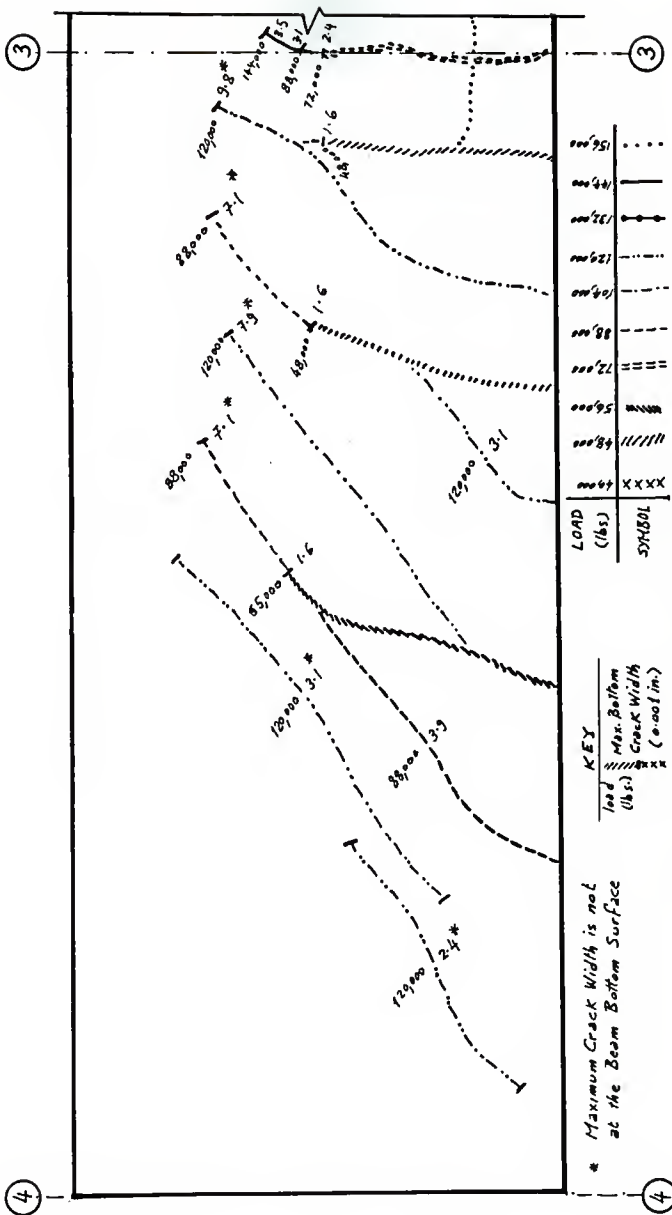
Details of Crack Propagation of Beam #1,
